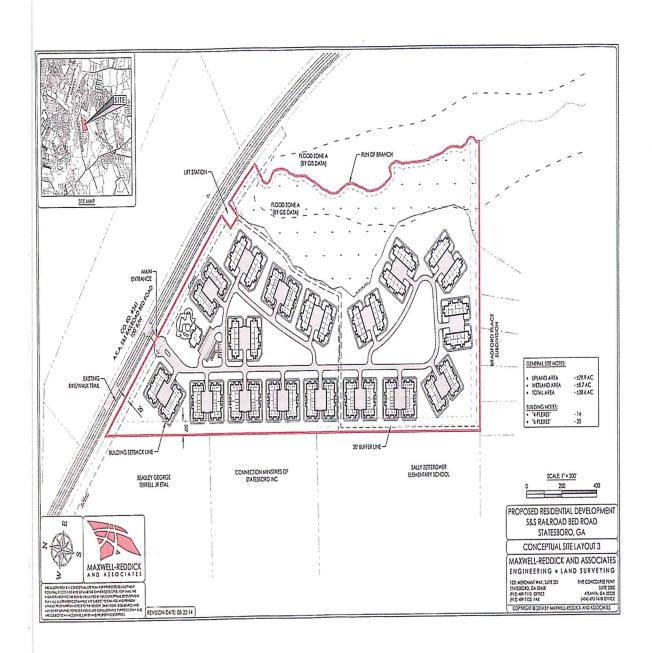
# EXHIBIT B: PROPOSED SITE PLAN CONT'D
